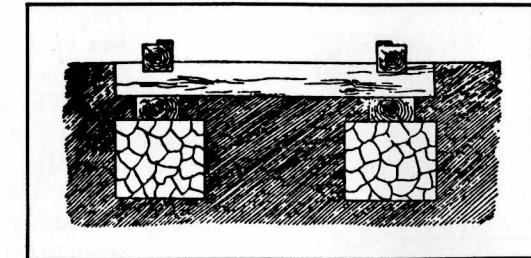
Iron strap rail, spiked to wooden stringers and supported by wooden ties over a gravel and wood sub-foundation.
